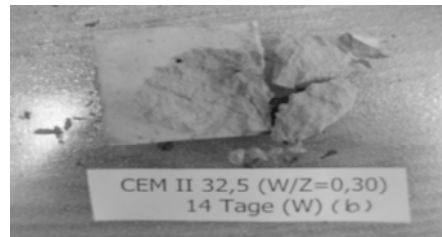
Local Spalling of HPC-Paste.
